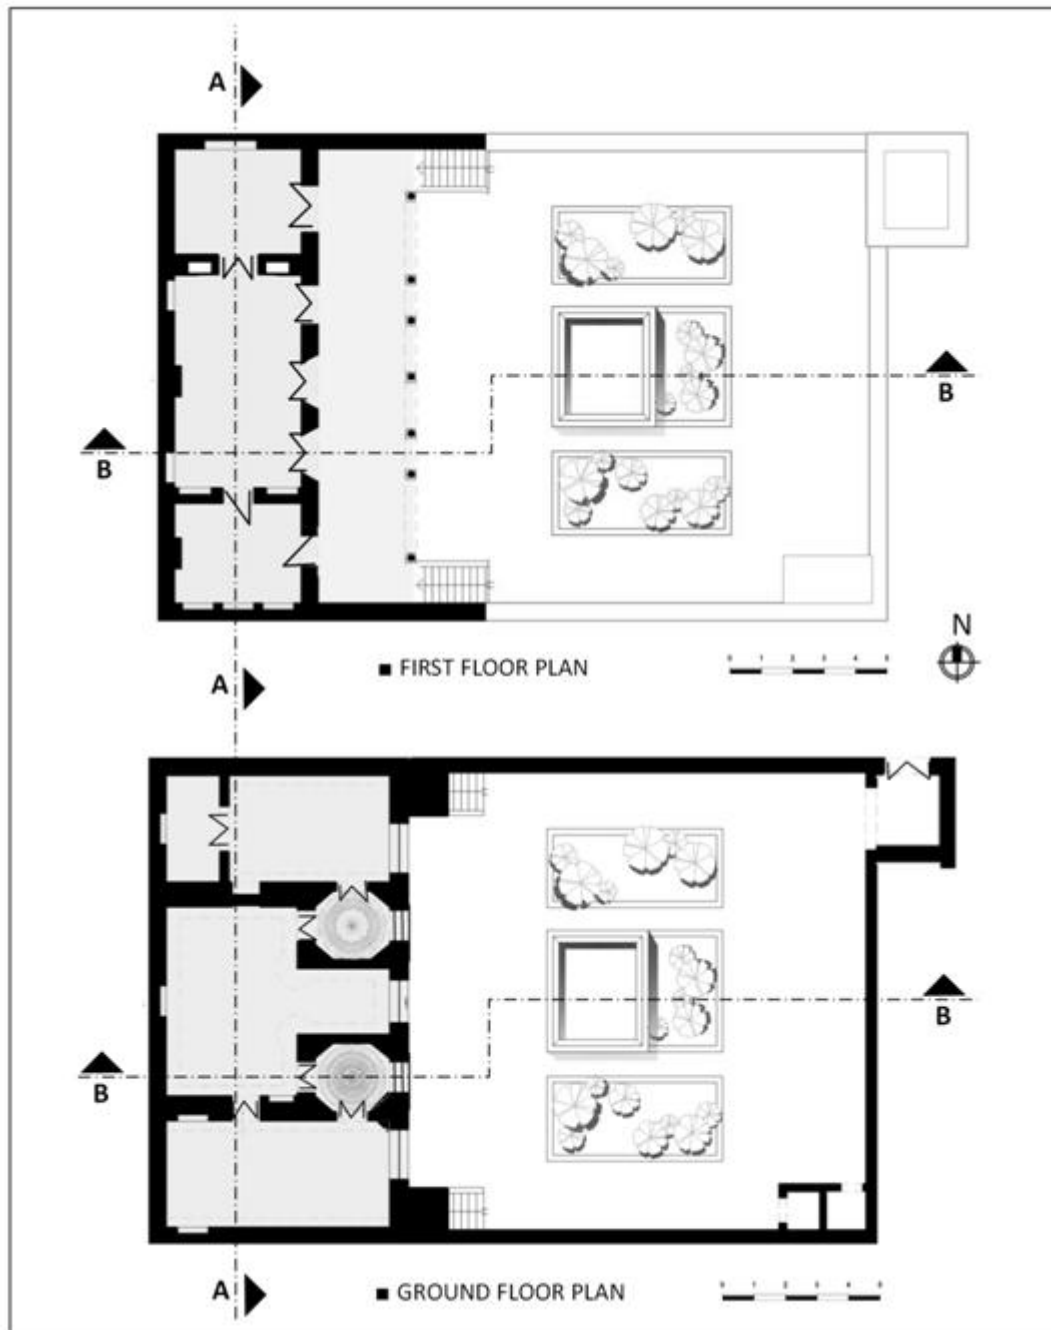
Plans of the Baqani house (Estaji, 2010, Kermani-Moqaddam, 2002b)
